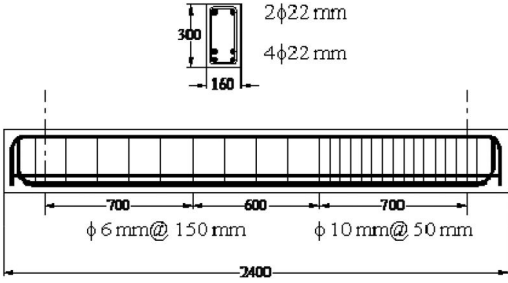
Geometry, arrangement of reinforcement and load for control specimen (Morsy et al, 2011).
